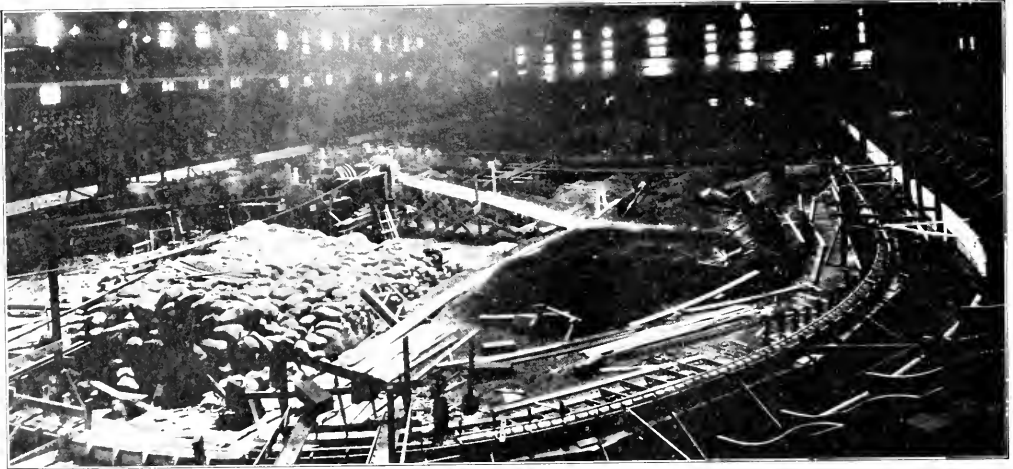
ON MAY 21 FORMS FOR THE RETAINING WALLS WERE COMPLETE AND THE POURING OF CONCRETE WAS GOING ON. THE PLUMBING WAS COMPLETE. THE DEEP DIVING POOL HAD BEEN EXCAVATED AND FORMS WERE BEING PLACED
